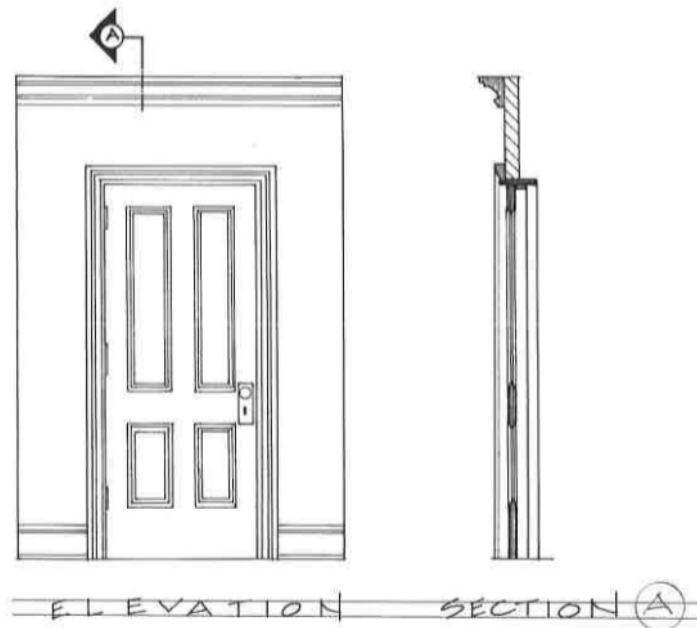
Example elevation section of a door cut at the section line "A" (Woodbridge 75)
